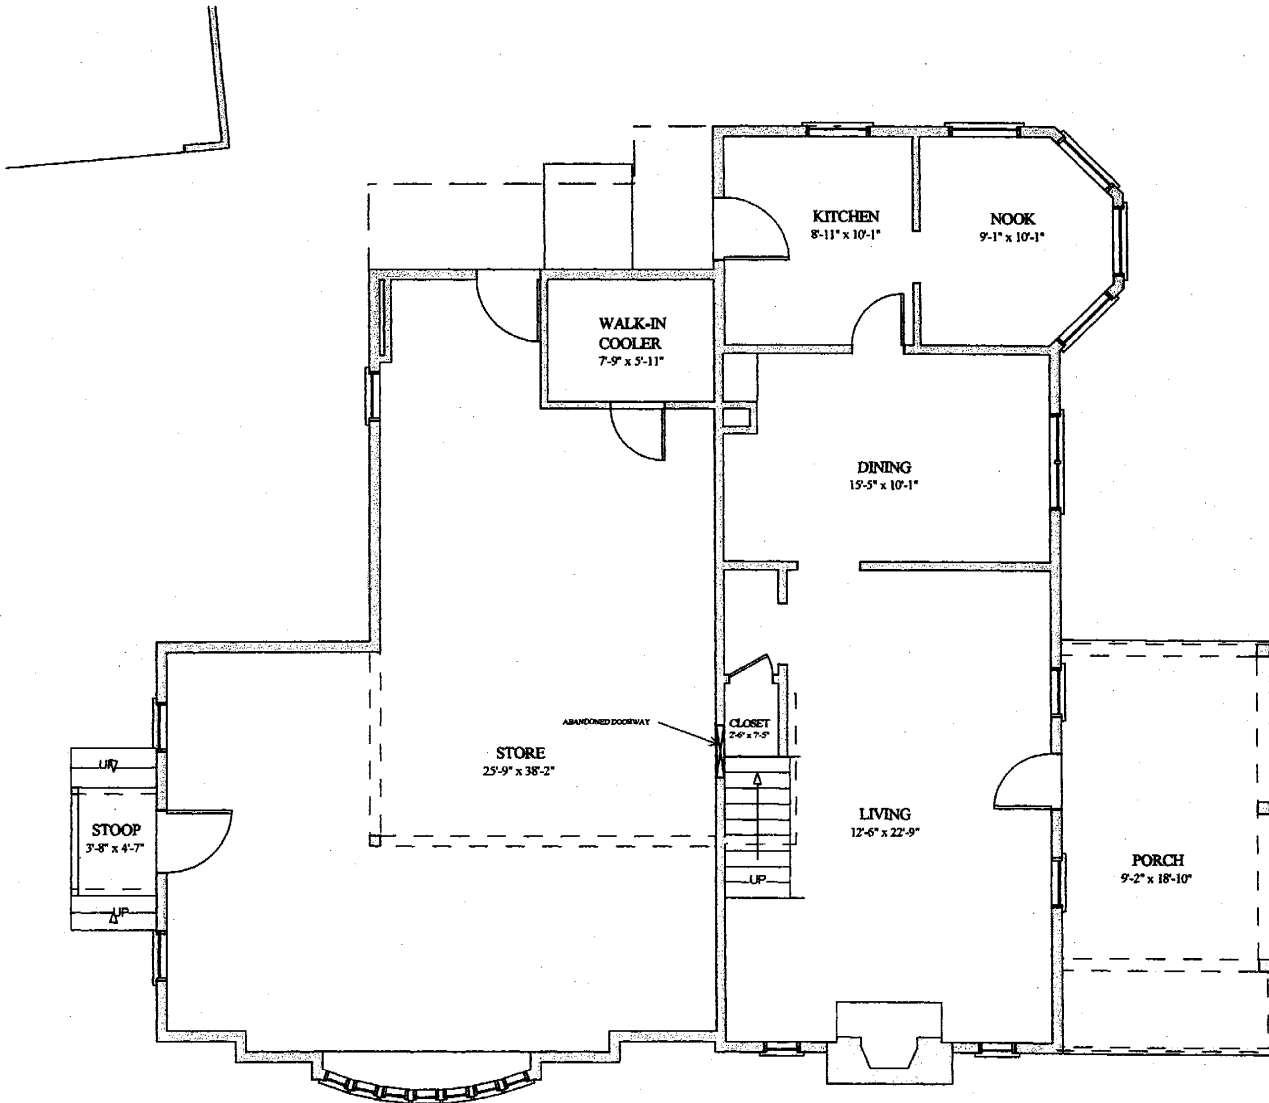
First floor plan. Shaded areas represent additions to the original bungalow. Drawing by Dean Brenneman & Jason Gagen, copyright 2004 by Brenneman & Pagenstecher, Inc.
